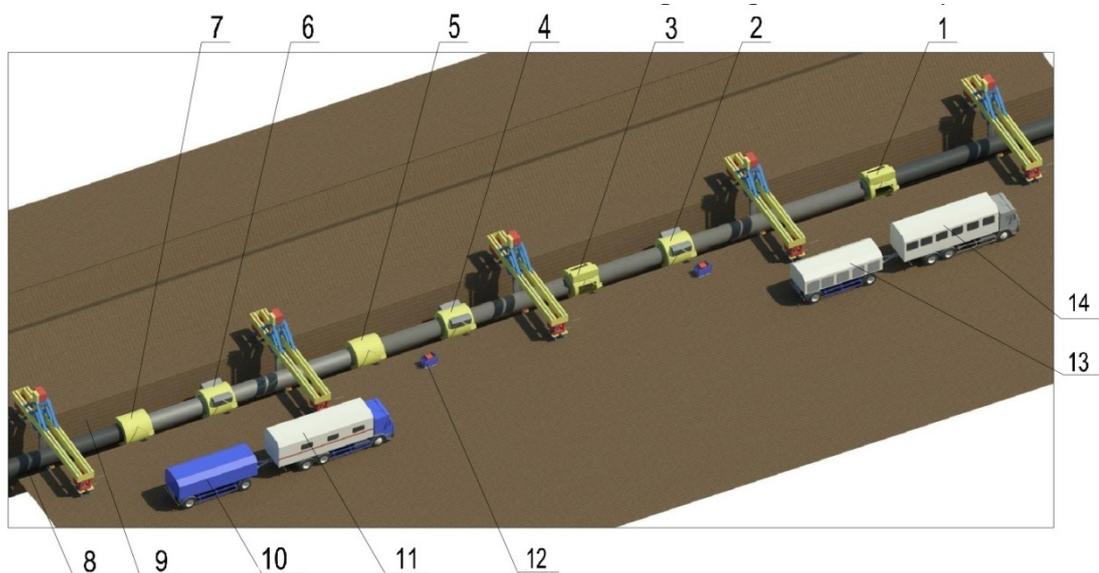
Spatial flow-chart for the major repair technique of the main pipeline section with re-insulation using the innovative supporting devices: 1 – cleaning machine, 2 – machine for secondary cleaning, 3 – cleaning machine for the final purification, 4 – machine for heating a pipe surface for the application of prime coating, 5 – machine for the primer application, 6 – machine for the heating the primed surface of the pipeline, 7 – insulation machine, 8 – pipeline section under repair, 9 – trench, 10 – maintenance trailer equipped for the primer regeneration and storing of insulation materials, 11 – mobile laboratory for weld inspection and insulation works, 12 – electric generator, 13 – container with the insulation stuff, 14 – maintenance crew vehicle.
